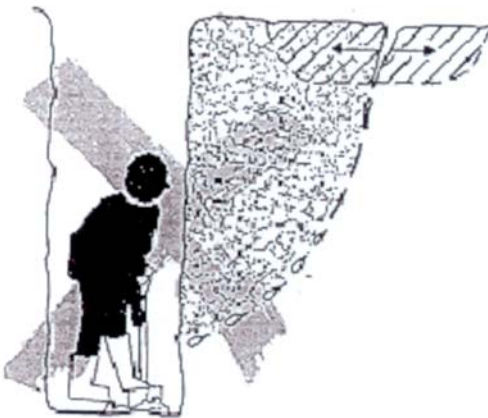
(a): This is a very dangerous situation, requiring ground support. It is a prohibited activity. As the excavation is greater than 1.25 metres deep, no worker should be in the trench unless support has been installed.
